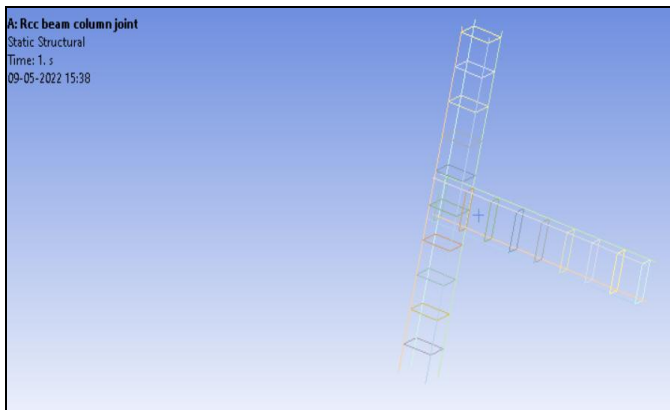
Reinforcement details of Retrofitted BCJ
